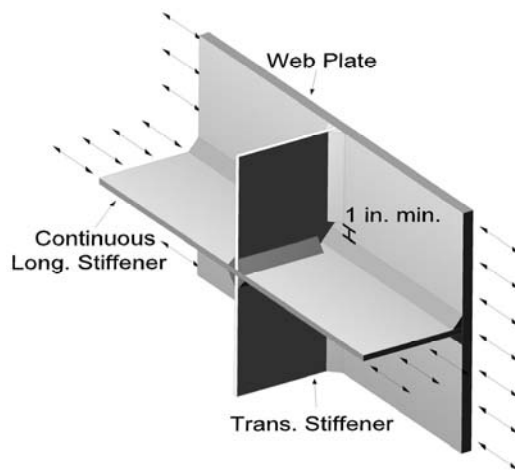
A Weld Detail where the Longitudinal Stiffener Is Continuous
